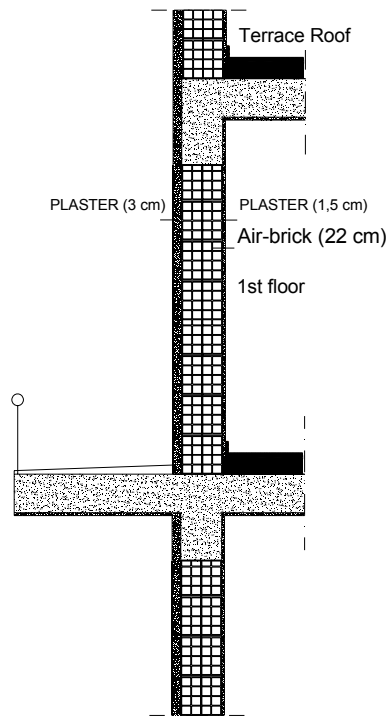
Detail of the single brick wall and the thermal bridge near the terrace.
